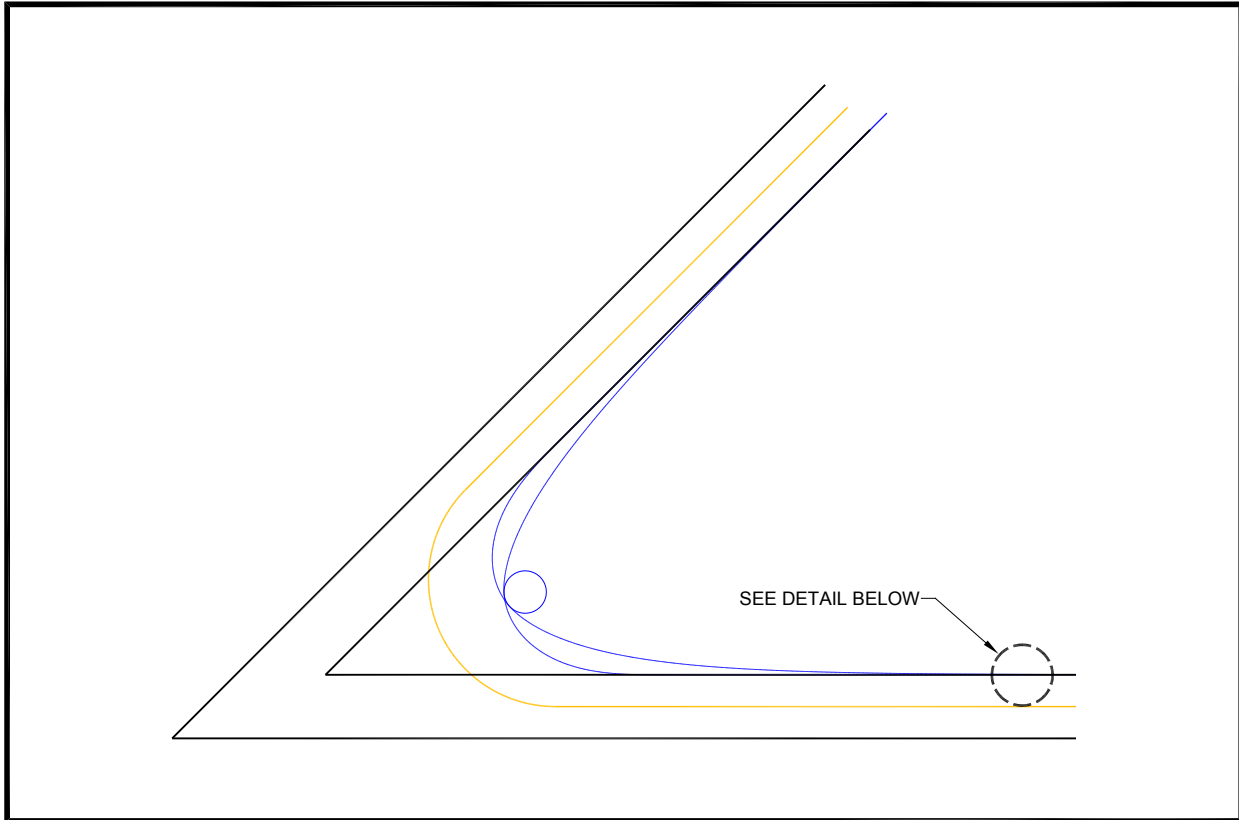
Pavement edge (main gear track + TESM) offset by 6 inches (15 cm)
